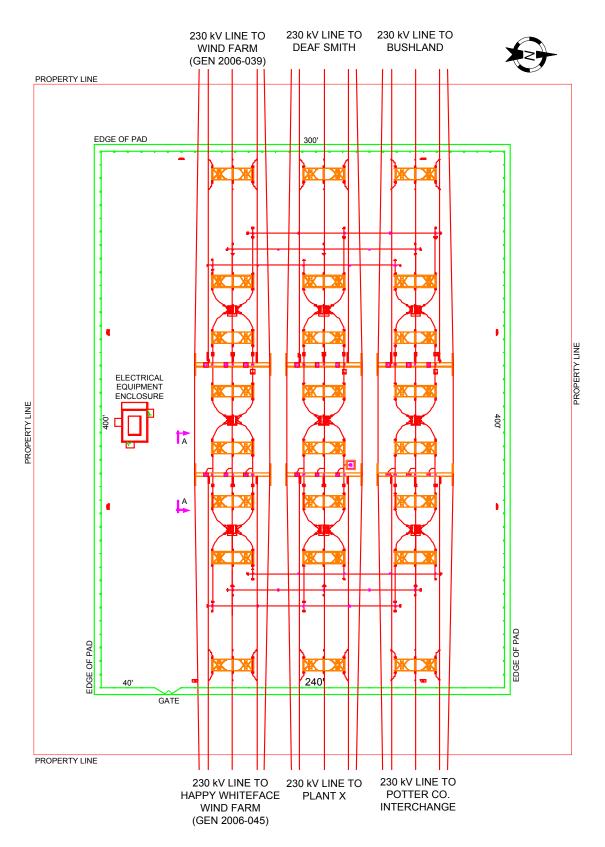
New SPS Switching Station Interconnection Facility Plan View
